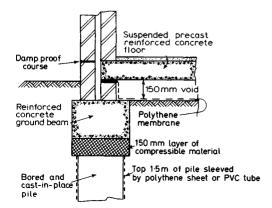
Ground beam for piles carrying a load-bearing wall
